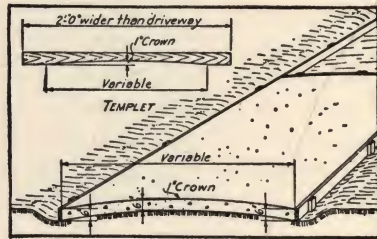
Method of constructing pavement type of driveway with crown.
